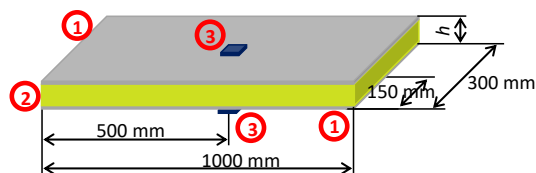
Geometry of sandwich panel specimens 1) composite face sheets; 2) core; 3) strain gages
